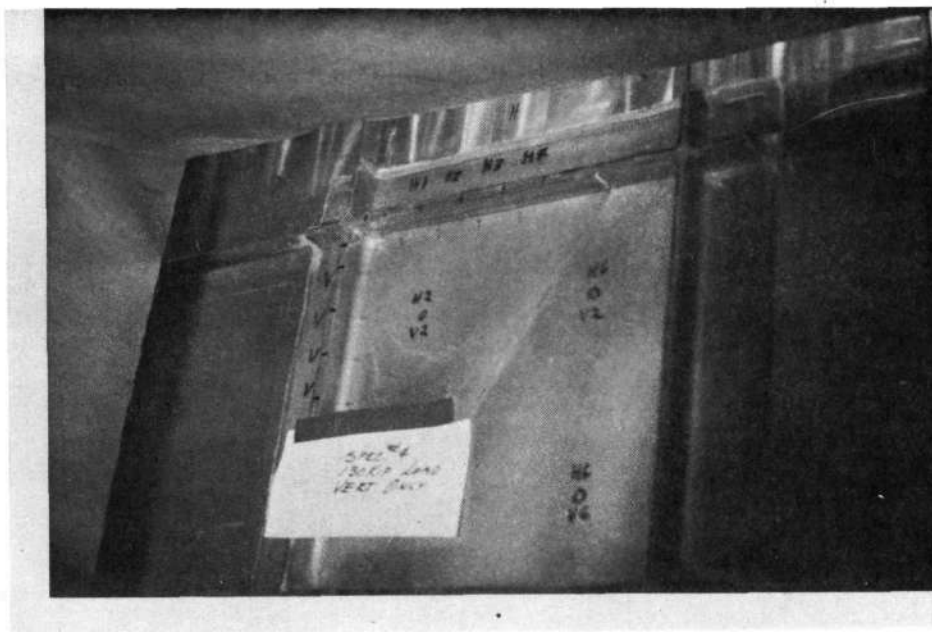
A- PANEL 4 UNIAXIAL LOAD
